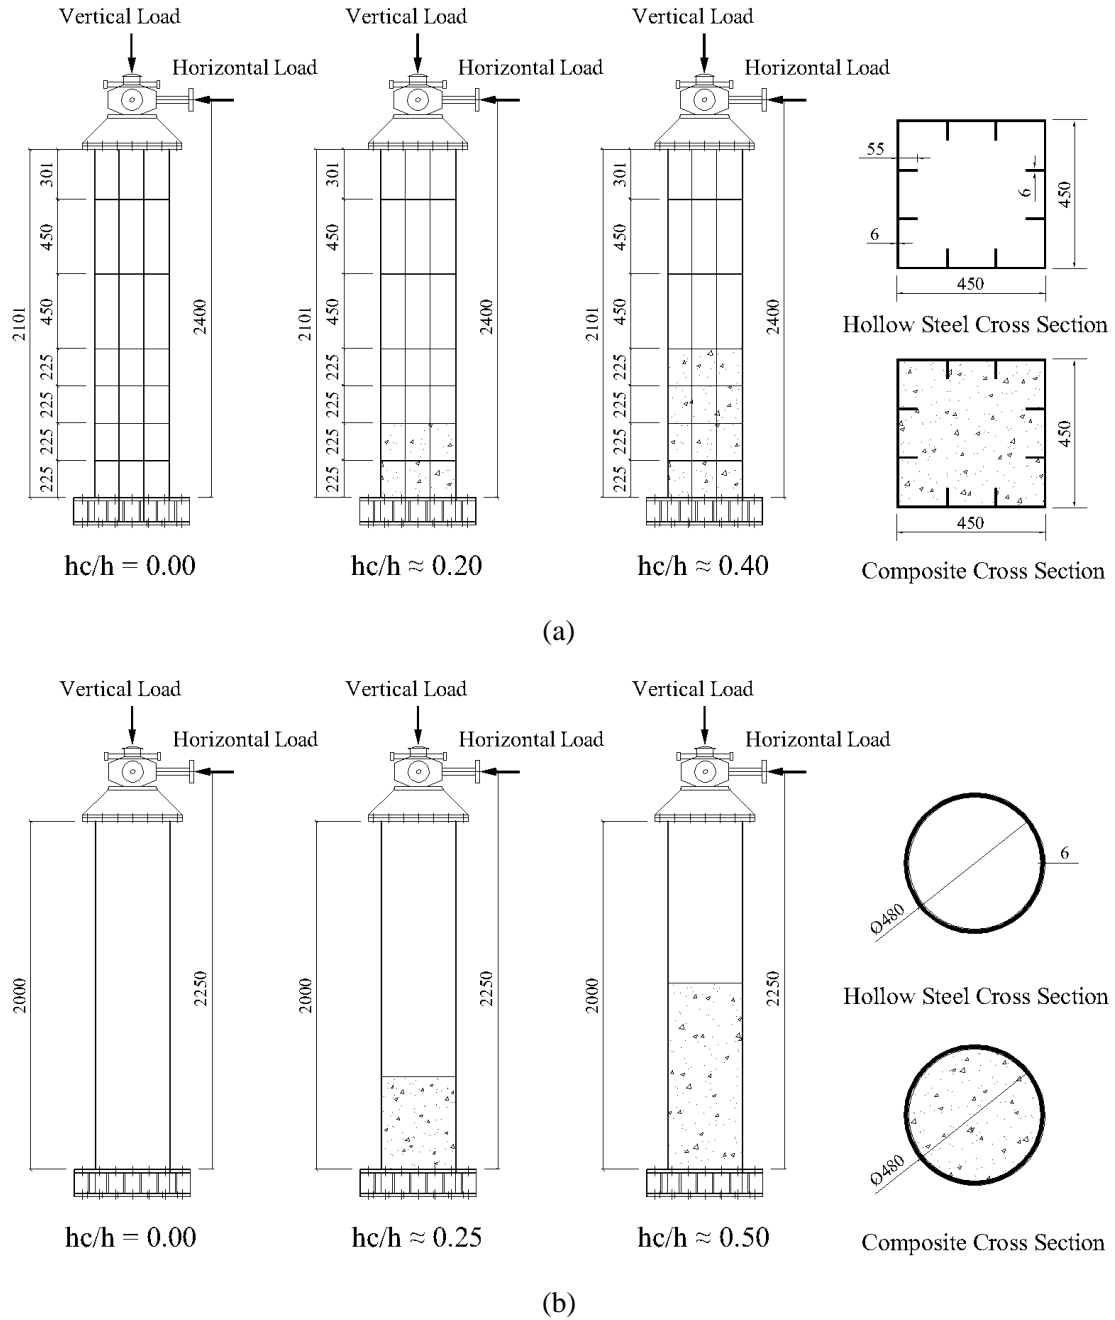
Test specimens: (a) Stiffened rectangular piers; (b) Un-stiffened circular piers
